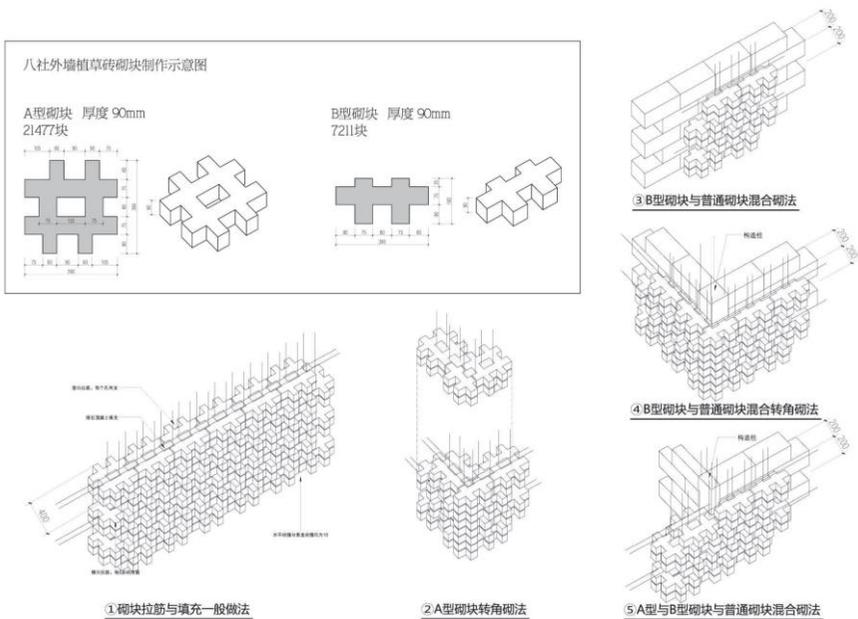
The tectonic diagram of brick-laying of the boundary wall on the first floor of No. 8 Port Apartment
